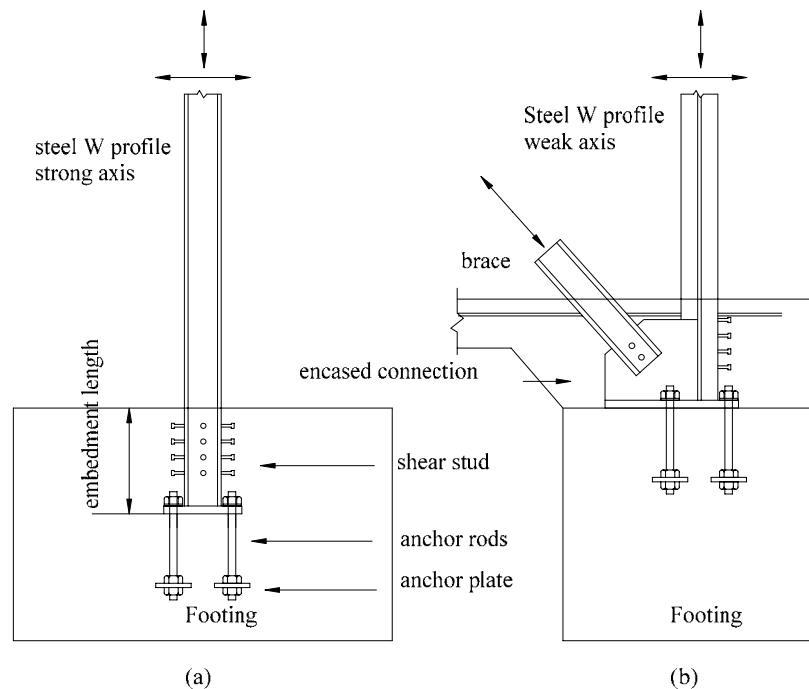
Unbraced and braced W steel columns embedded in concrete
